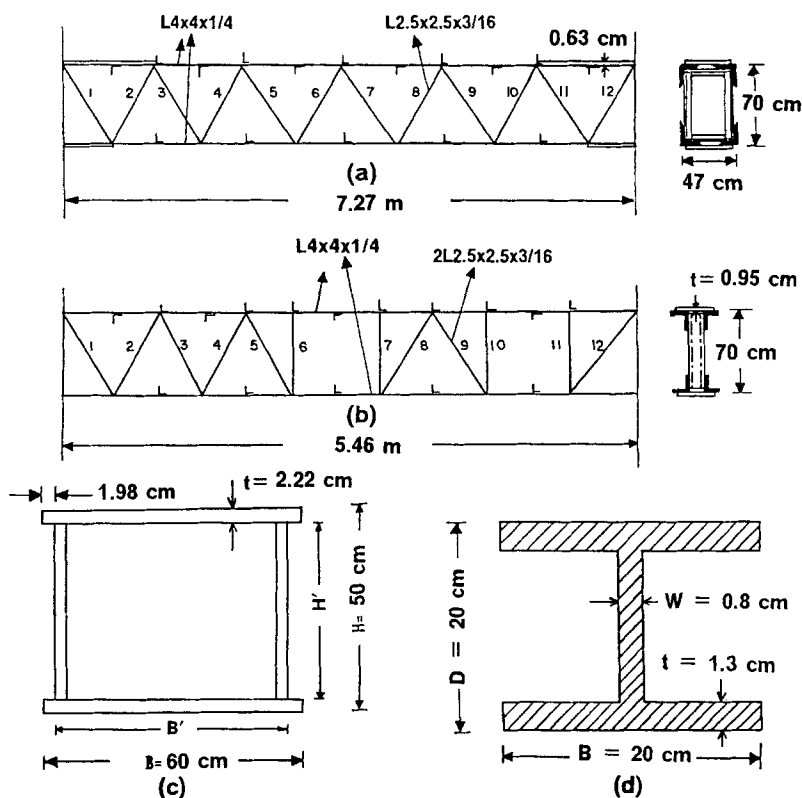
Typical Structural Members: (a) Long-Direction Girder; (b) Short-Direction Girder; (c) Welded Box Column; and (d) Bracing Member
